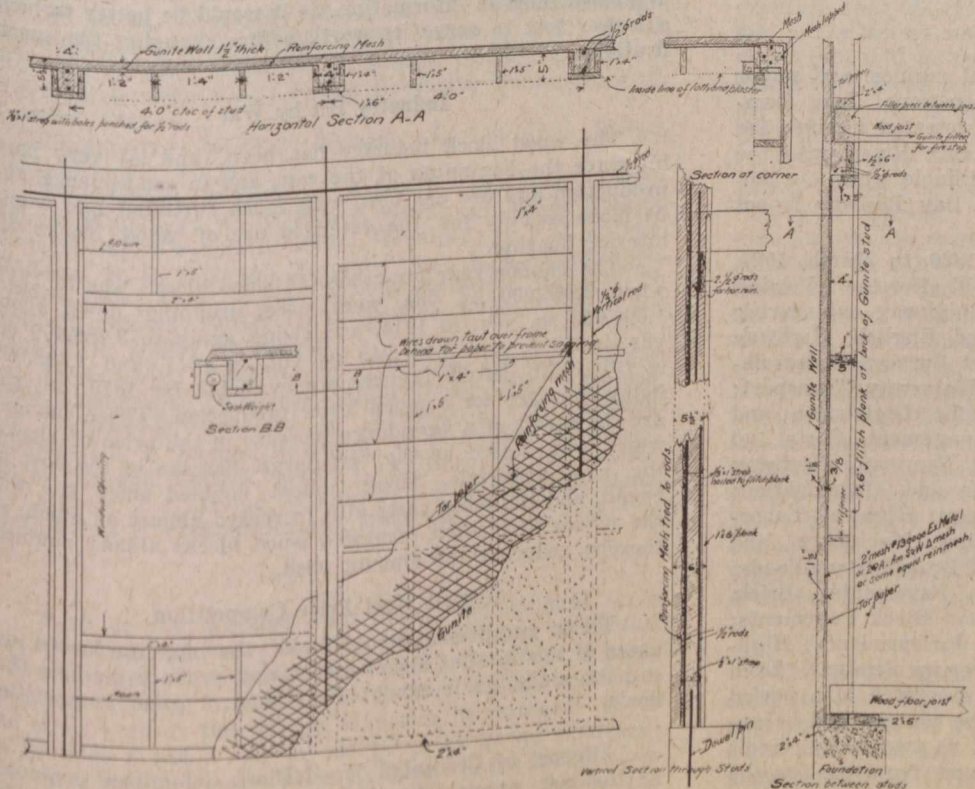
STRUCTURAL DETAILS OF "GUNITÉ" HOUSE WALL
